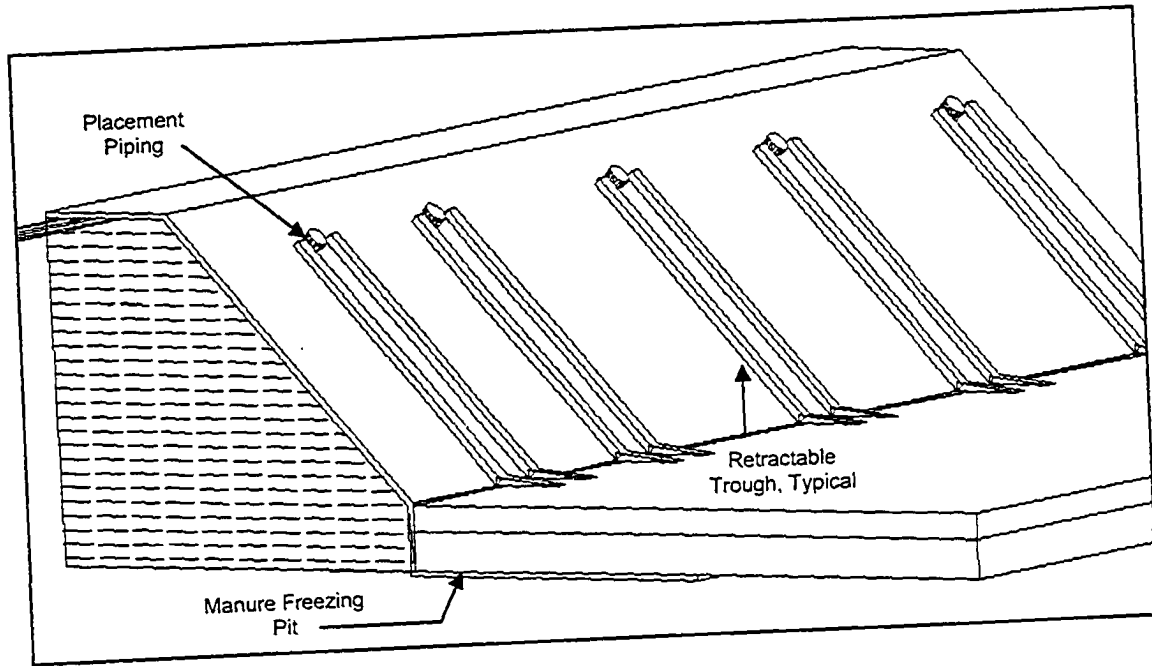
Partial 3D view of manure placement troughs and outlet piping for layer placement.
